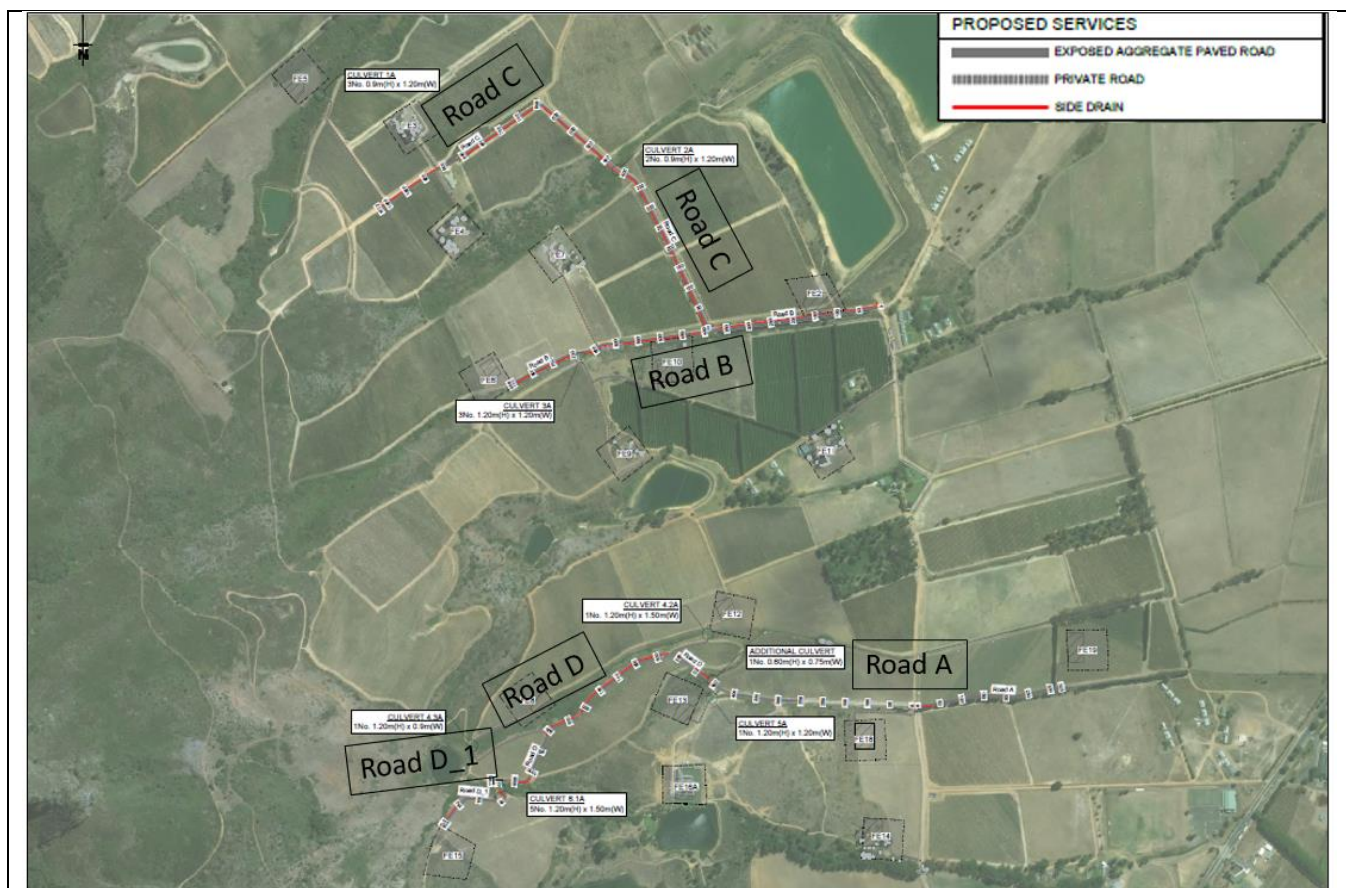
Proposed formalisation of existing farm roads and stormwater infrastructure (swales and culverts) (source: Drawing 19111-C-FigureL, Lyners 2022)
